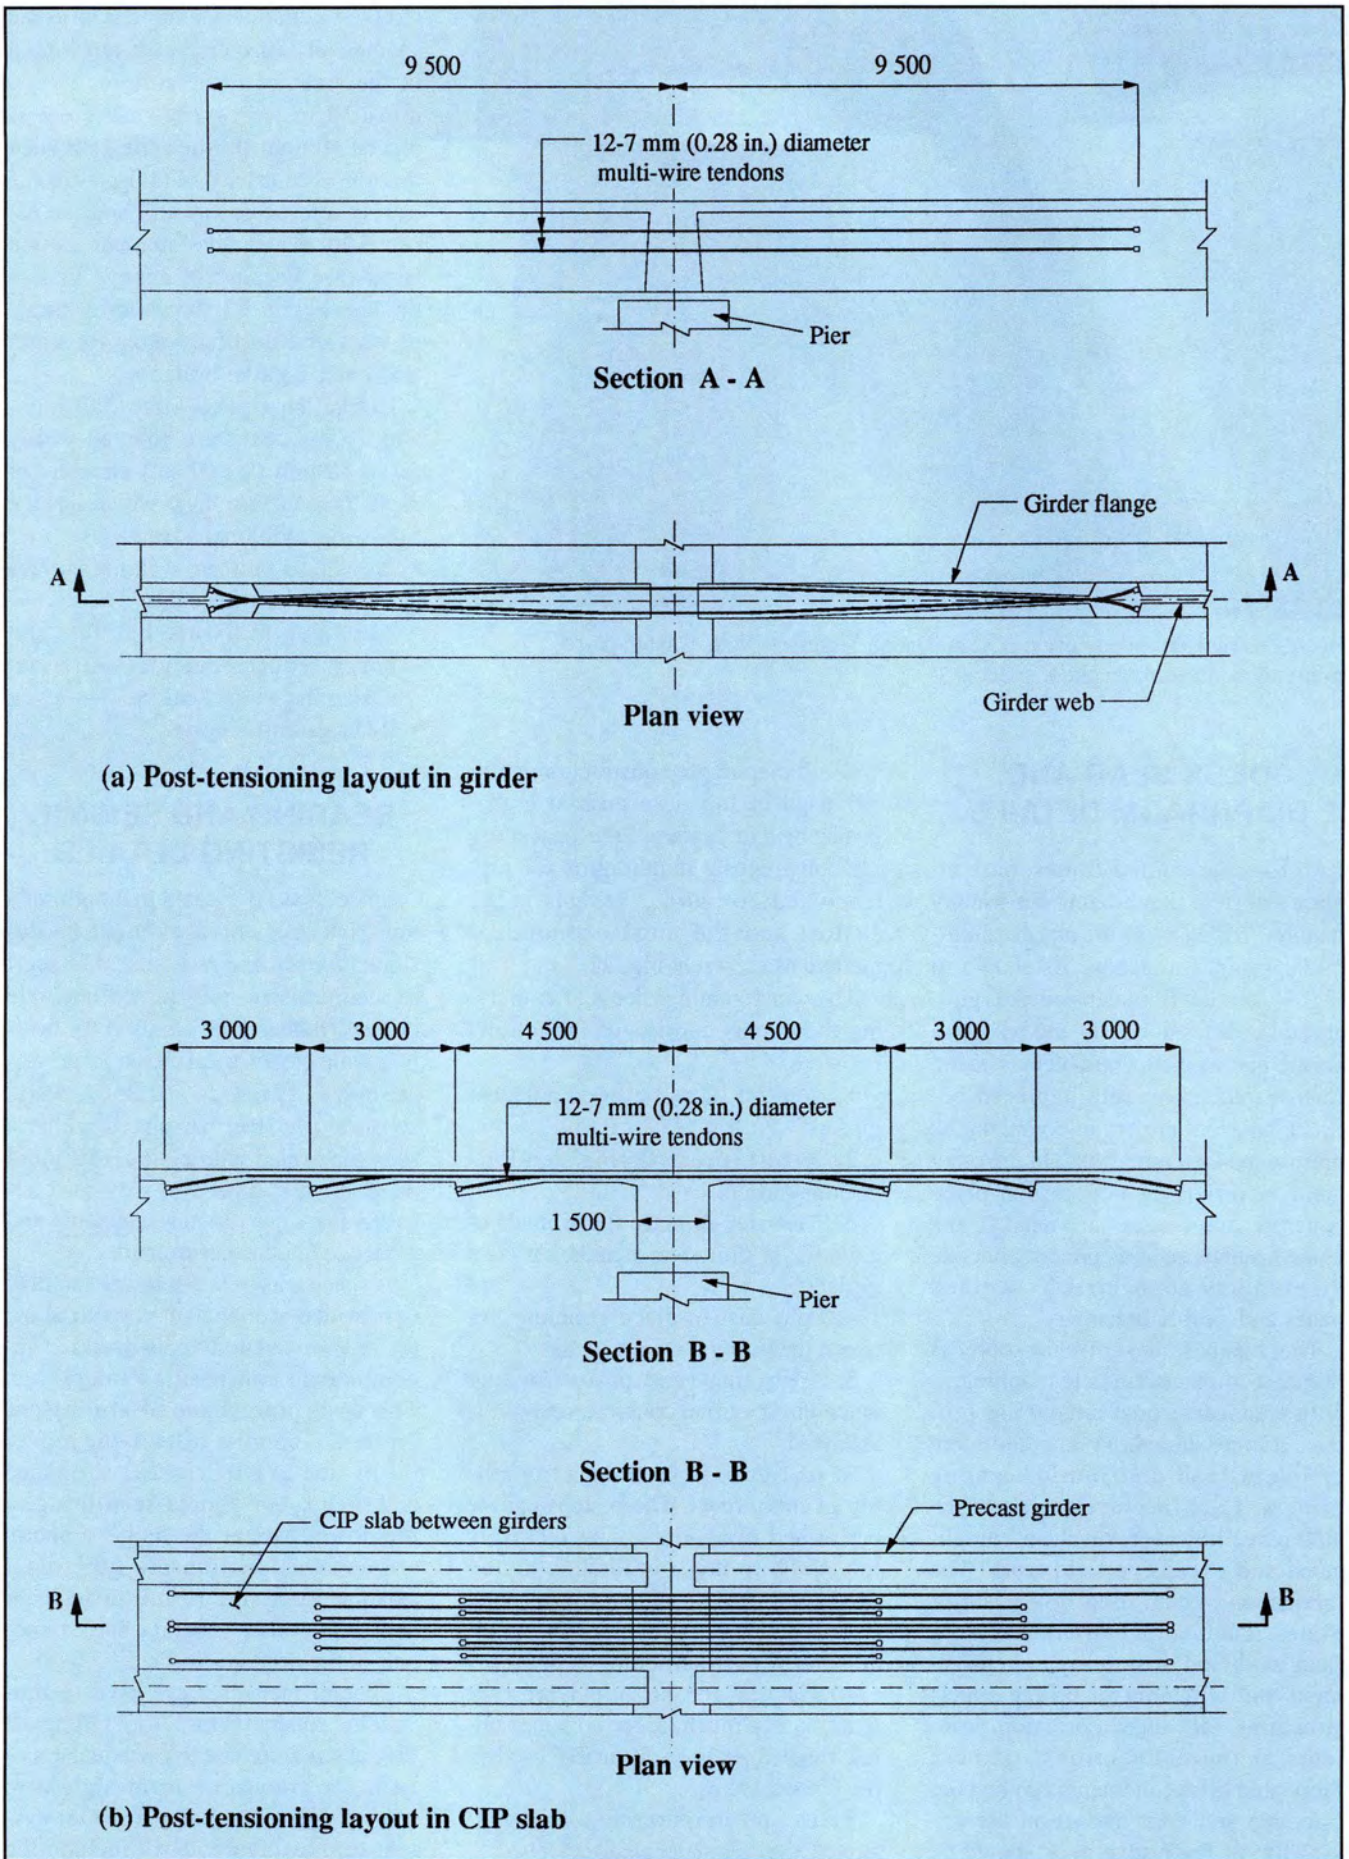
Typical layout of post-tensioning tendons for continuity of I-girder bridges.
